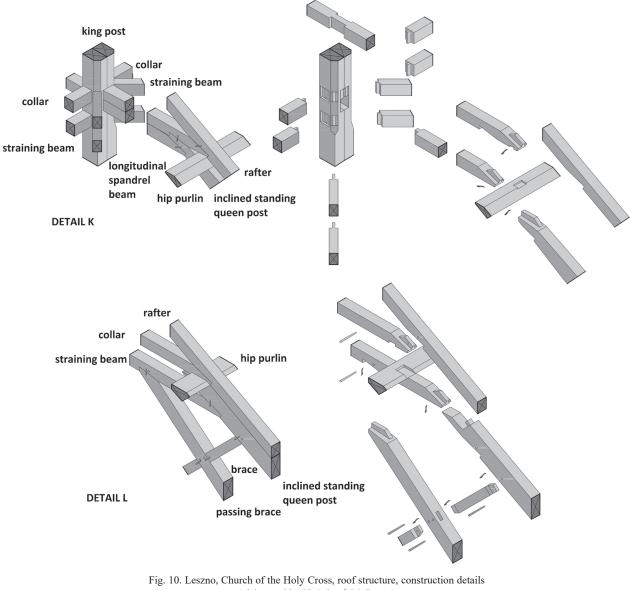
Leszno, Church of the Holy Cross, roof structure, construction details (elaborated by U. Schaaf, M. Prarat)
